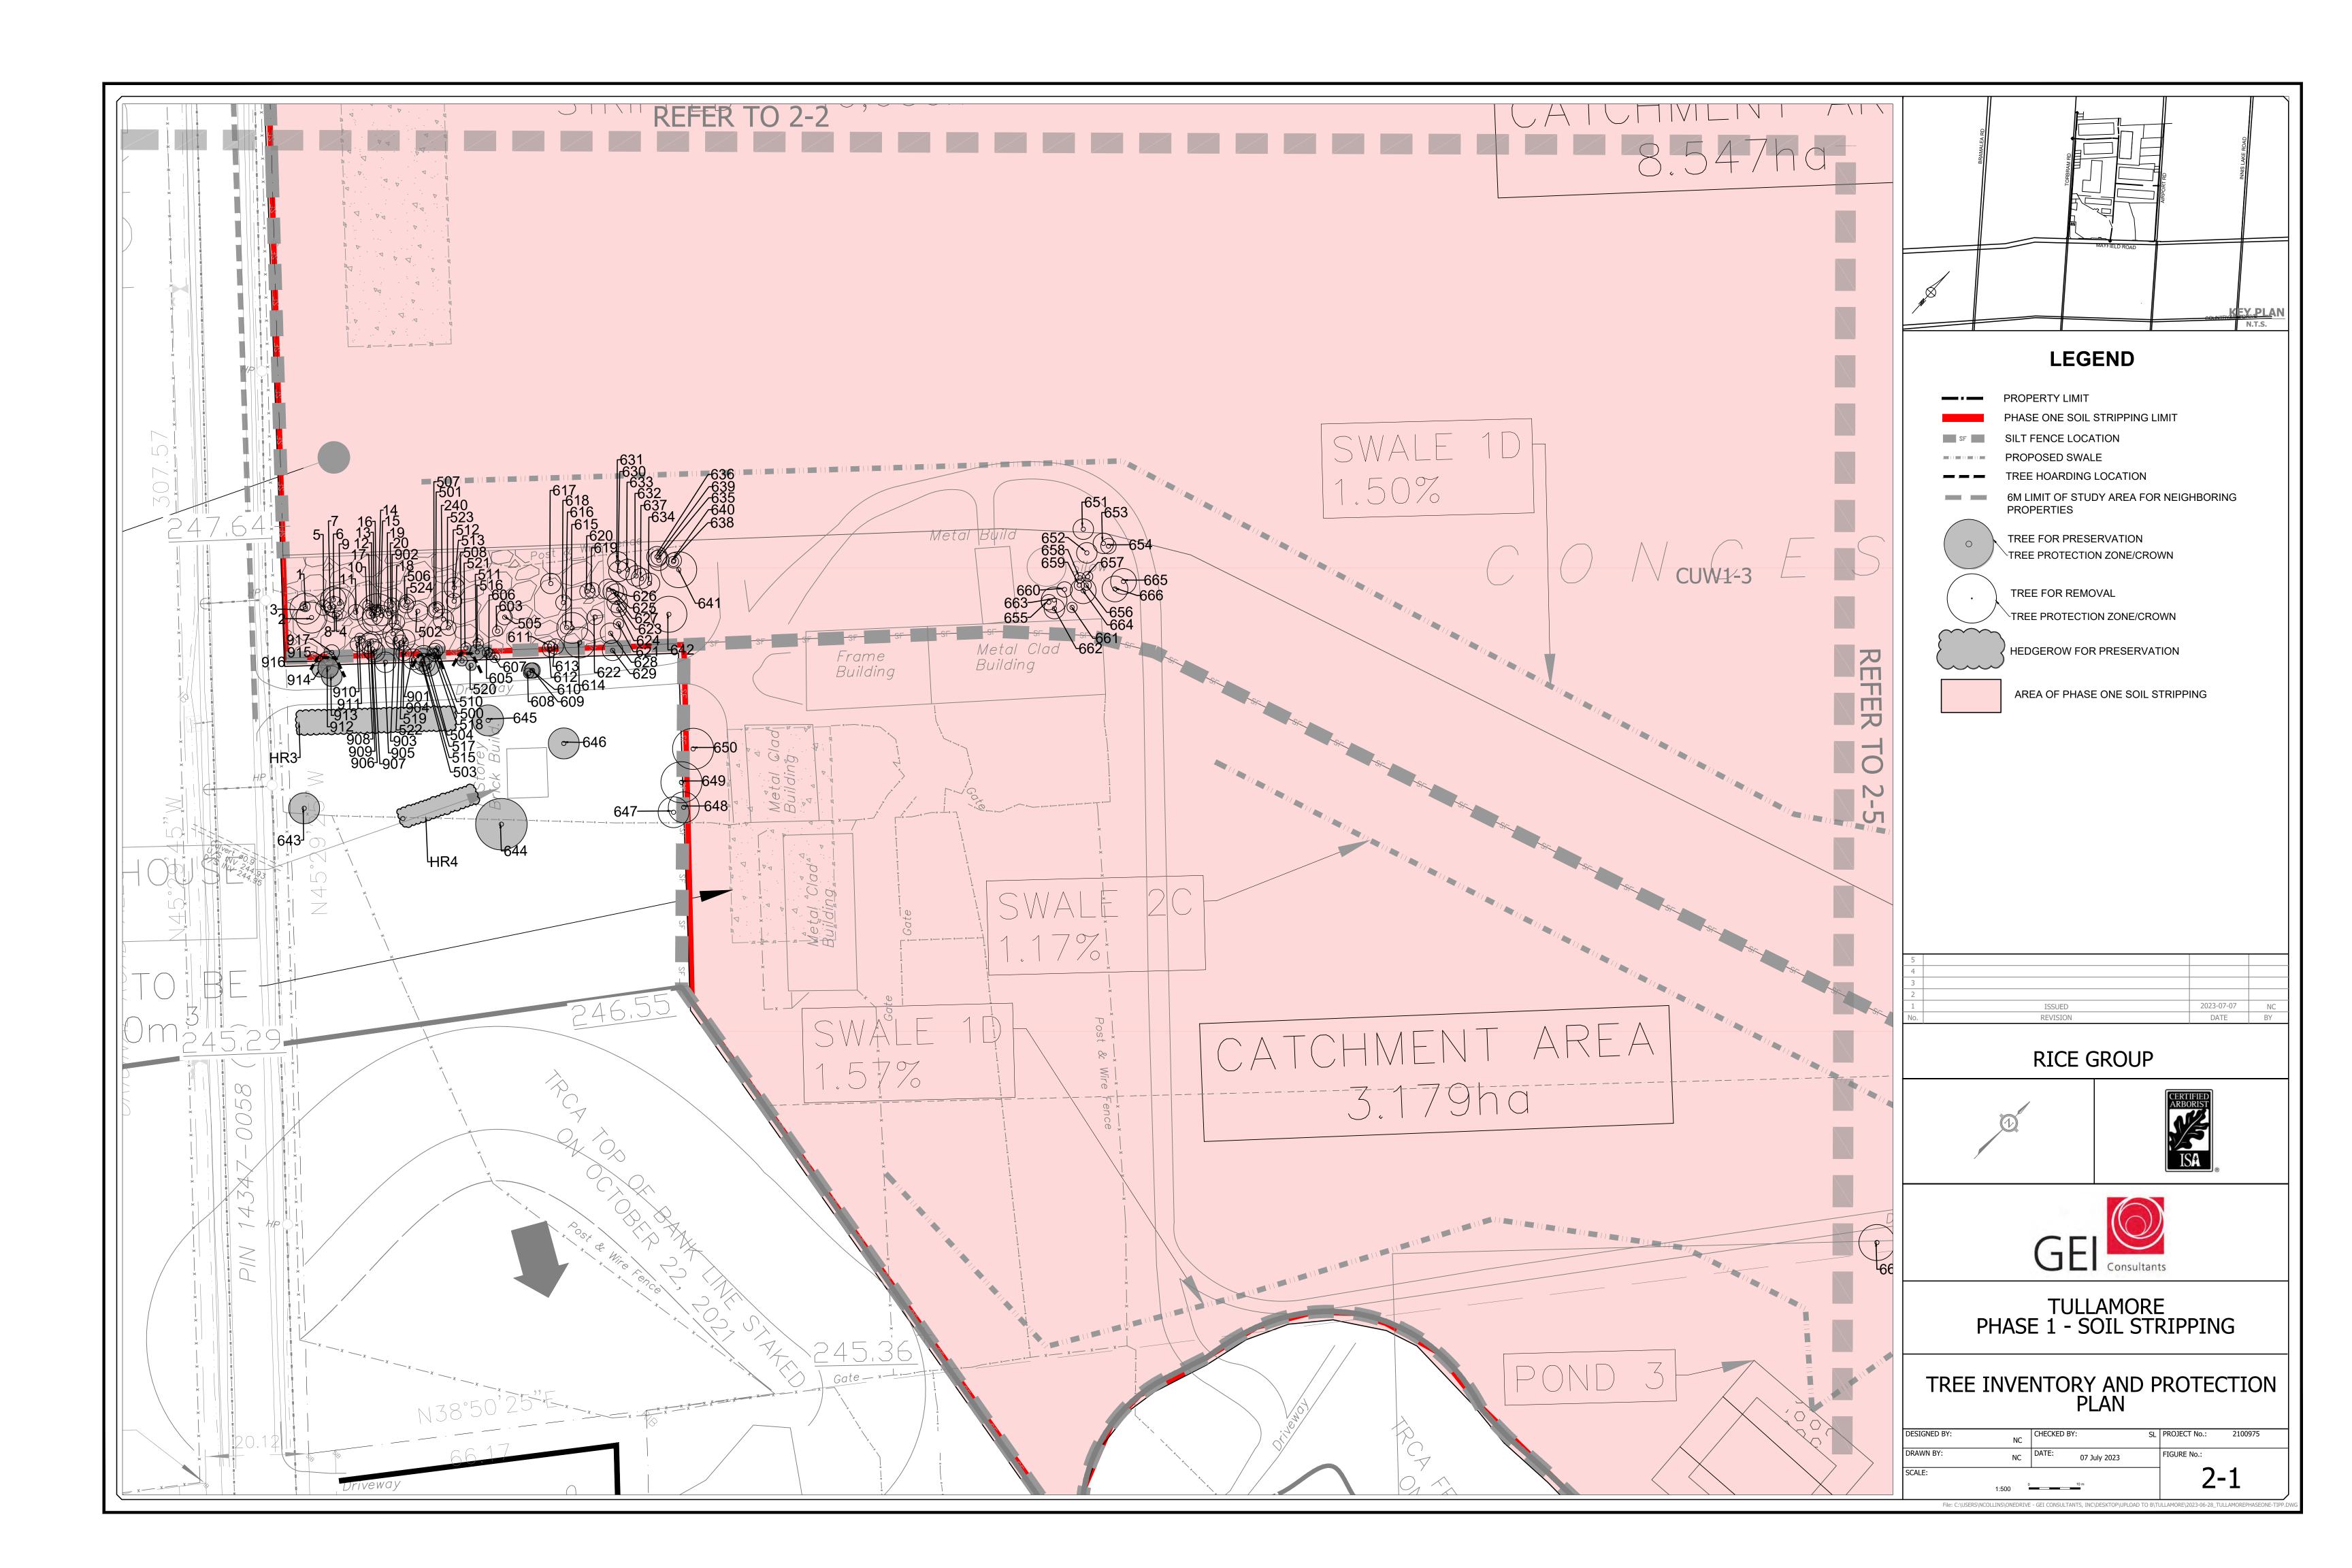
Proposed Work Limits Figures 2-1-2-10: Tree Inventory and Preservation Plan
